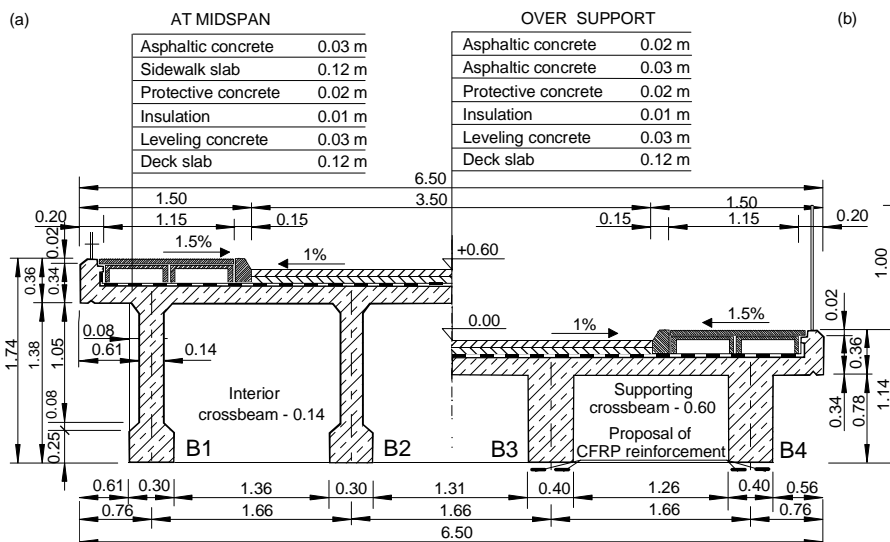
Cross-sections of post-tensioned concrete span at: (a) midspan (before repair), (b) support (after its renovation)
